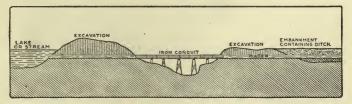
Showing ditch extended across a low place through an iron conduit supported on trestle work.
